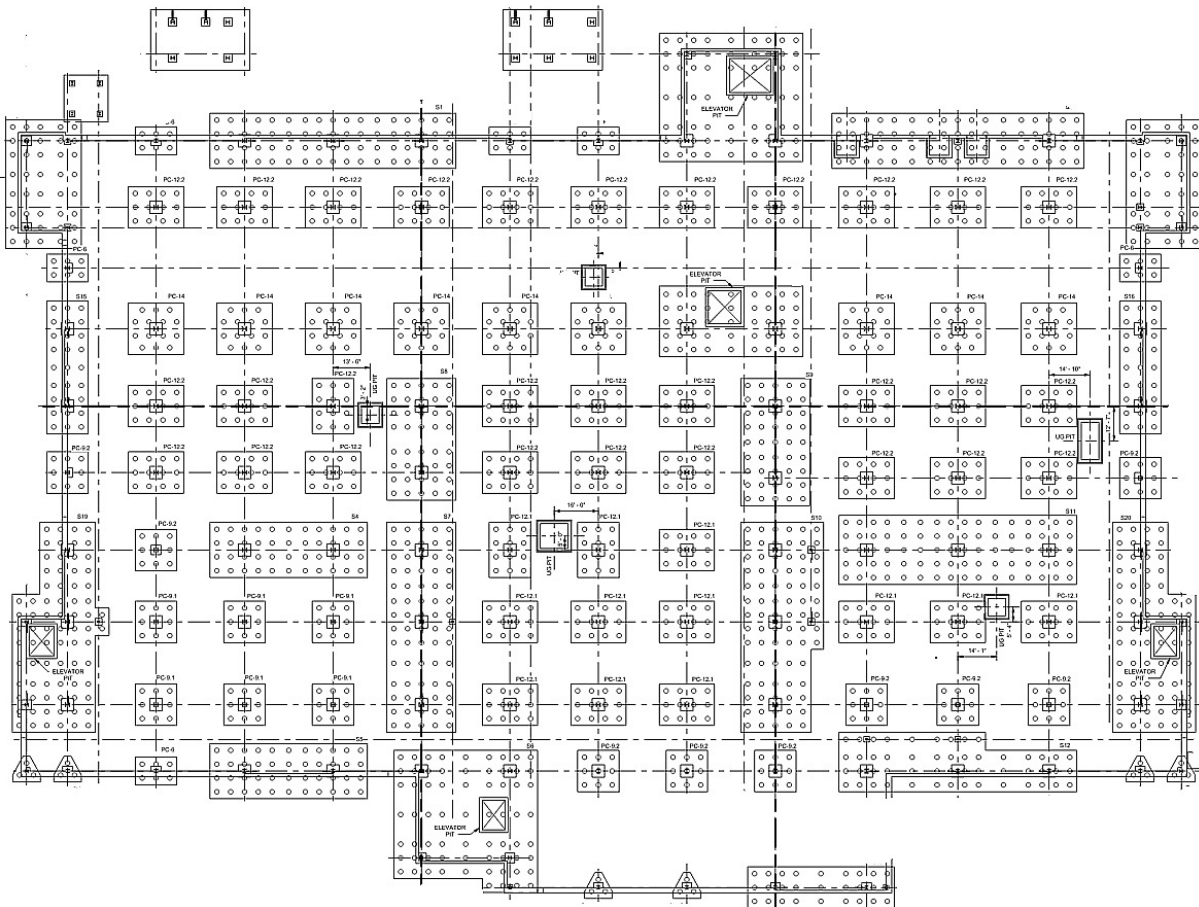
Peptide 1 Facility Pile Caps and Floor
